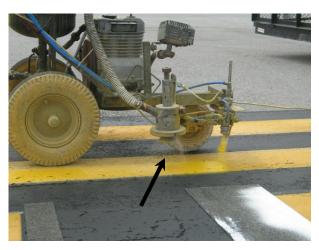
GLASS BEAD DISPENSER ON AN ATOMIZED HAND MACHINE.
